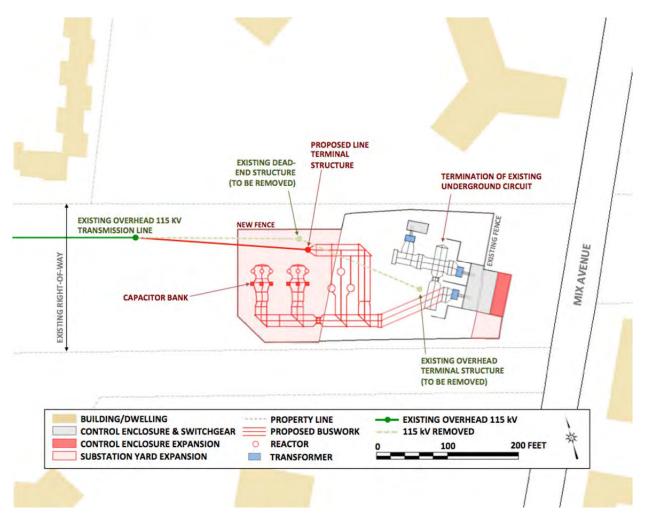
Plan view of the proposed expansion of the Mix Avenue Substation.
